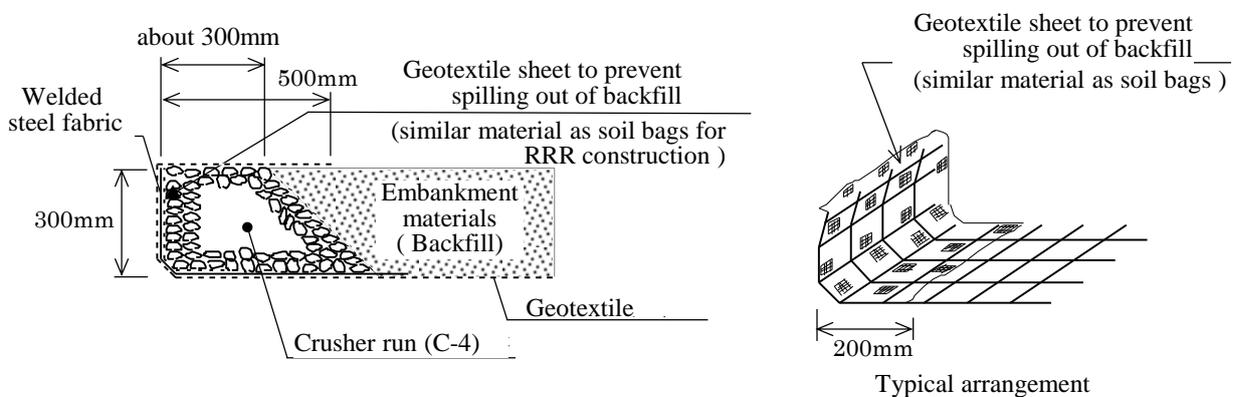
Wrapping geosynthetic layer around welded steel fabric
